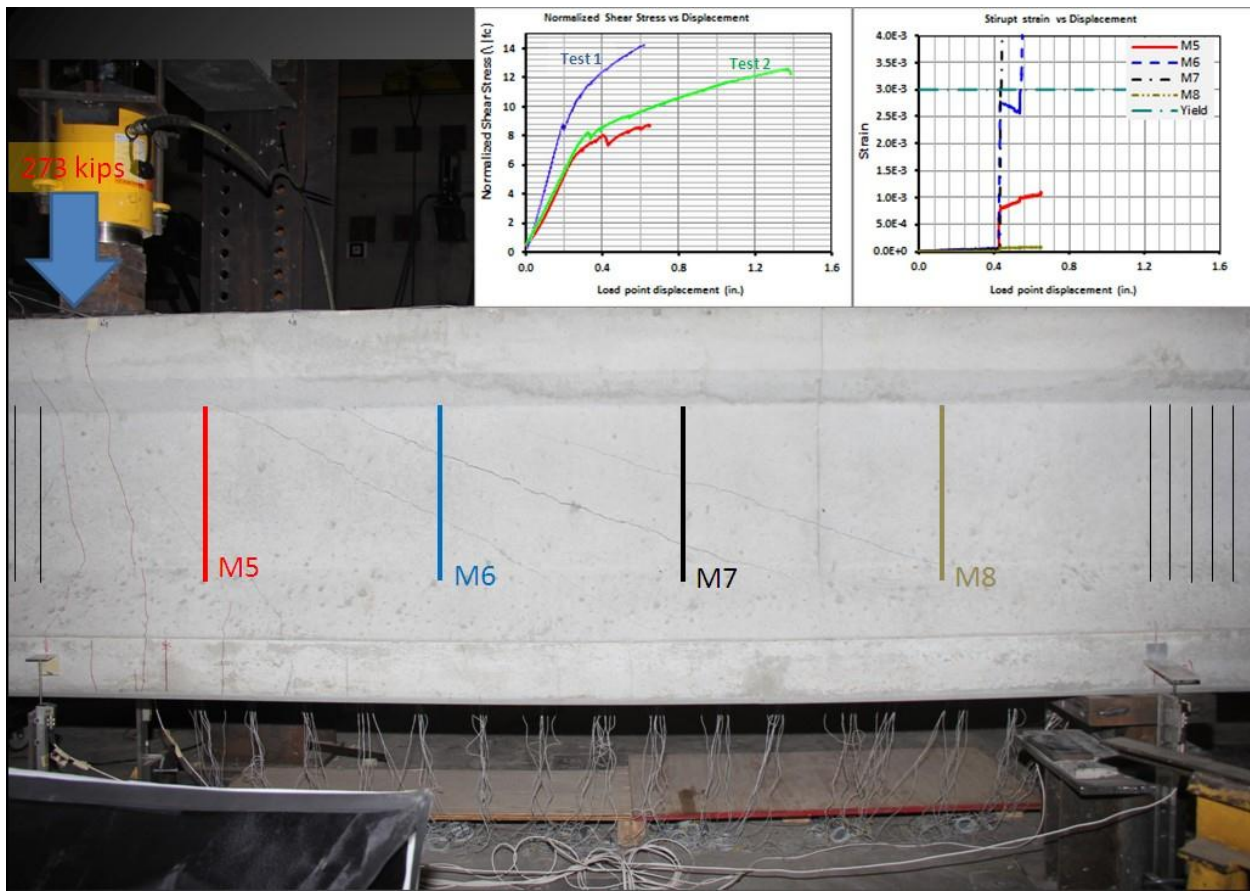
Beam 2 Test 3 Peak Load Before Failure.
